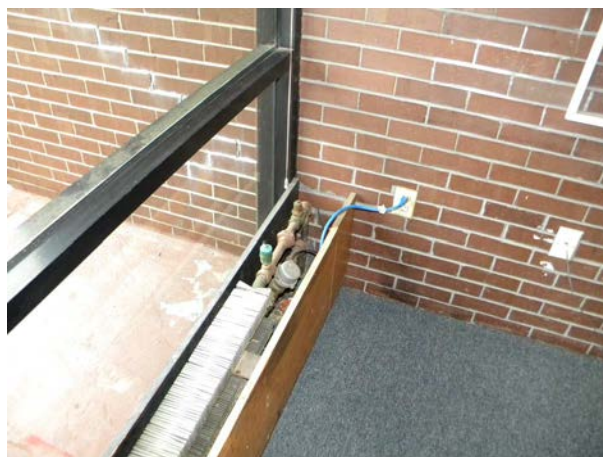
Finned tube heat source mounted to storefront assembly at receiving area.
